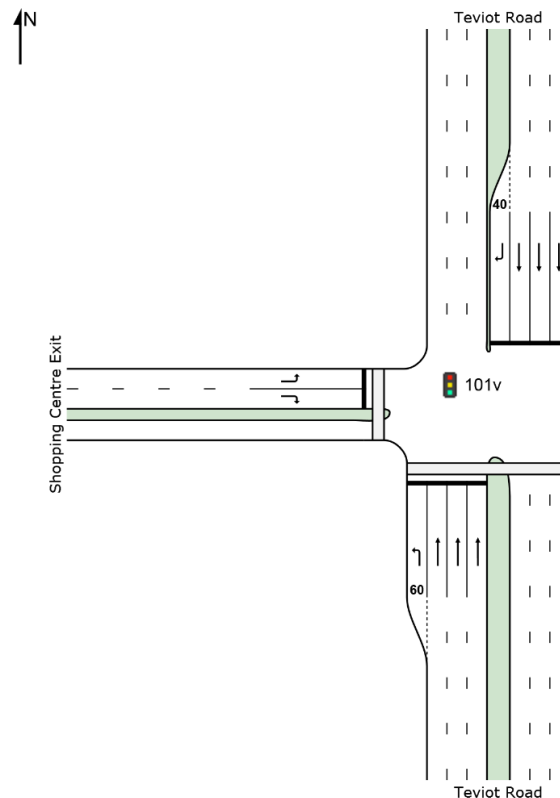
Teviot Road / Greenbank Shopping Centre Intersection Layout
